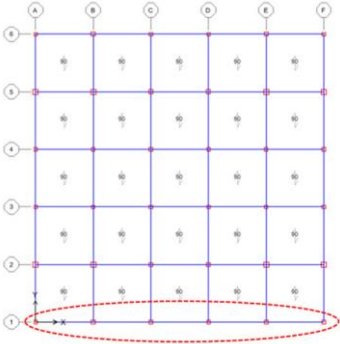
Plan view of the structure and exterior frame that modeled in 2D modeling.
